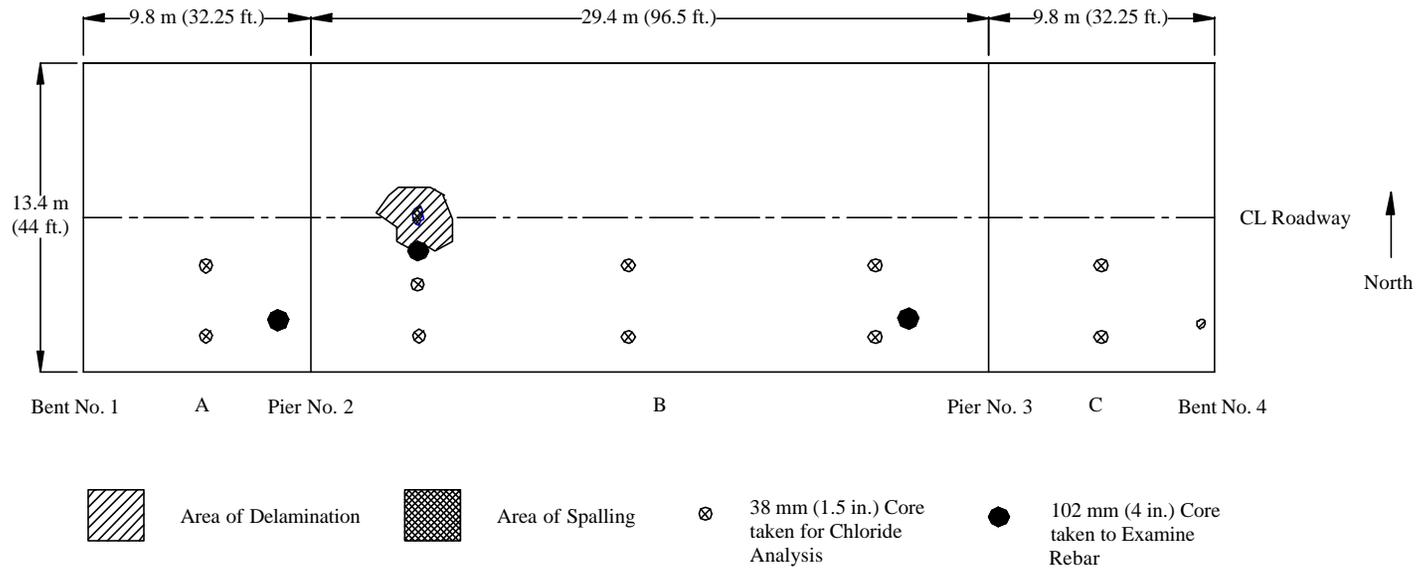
Delaminations, Spalls, and Location of Cores for Structure #6-50-6624
